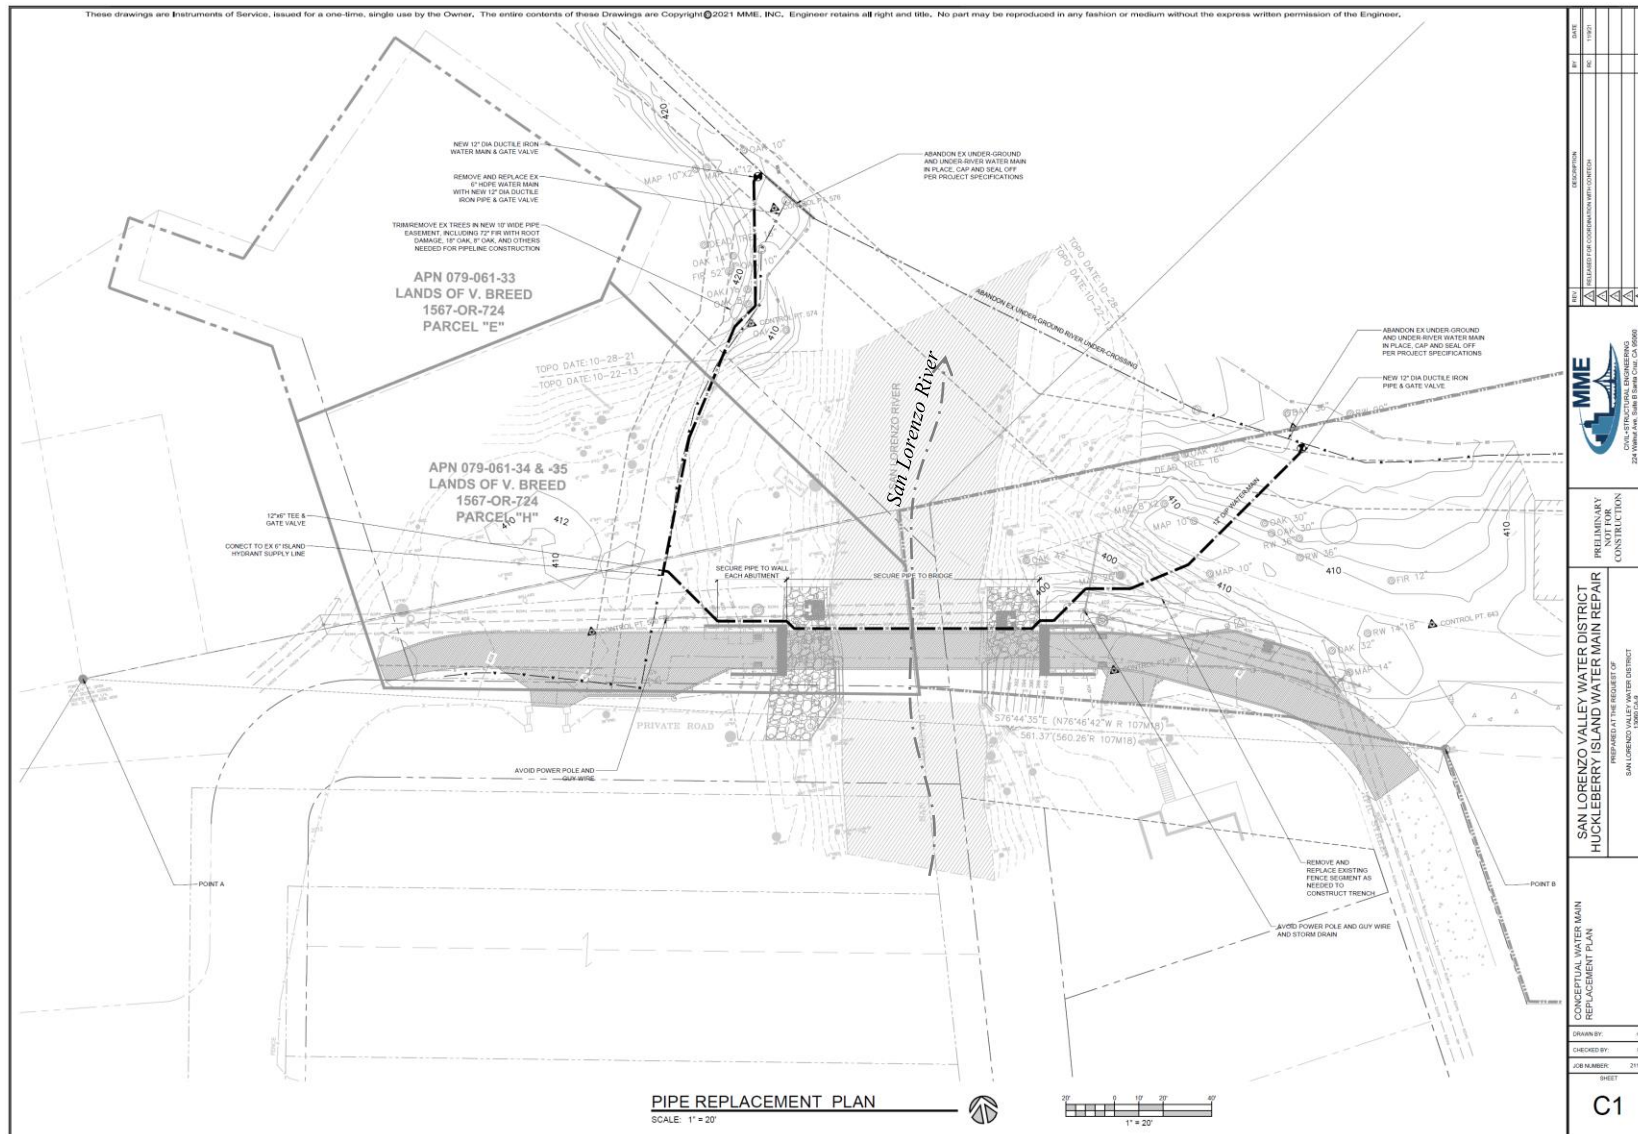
Site Layout Plan, Water Main Repair Project Plan, dated January 2022
